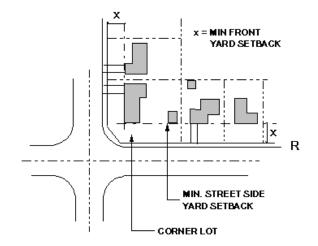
D1a 2-1 Accessory Building Street Setback
